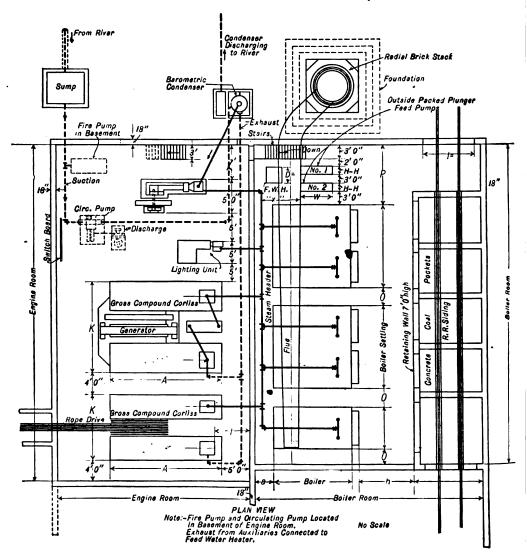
PRELIMINARY SKETCH, SHOWING ARRANGEMENT OF BOILER- AND ENGINE-ROOM.
